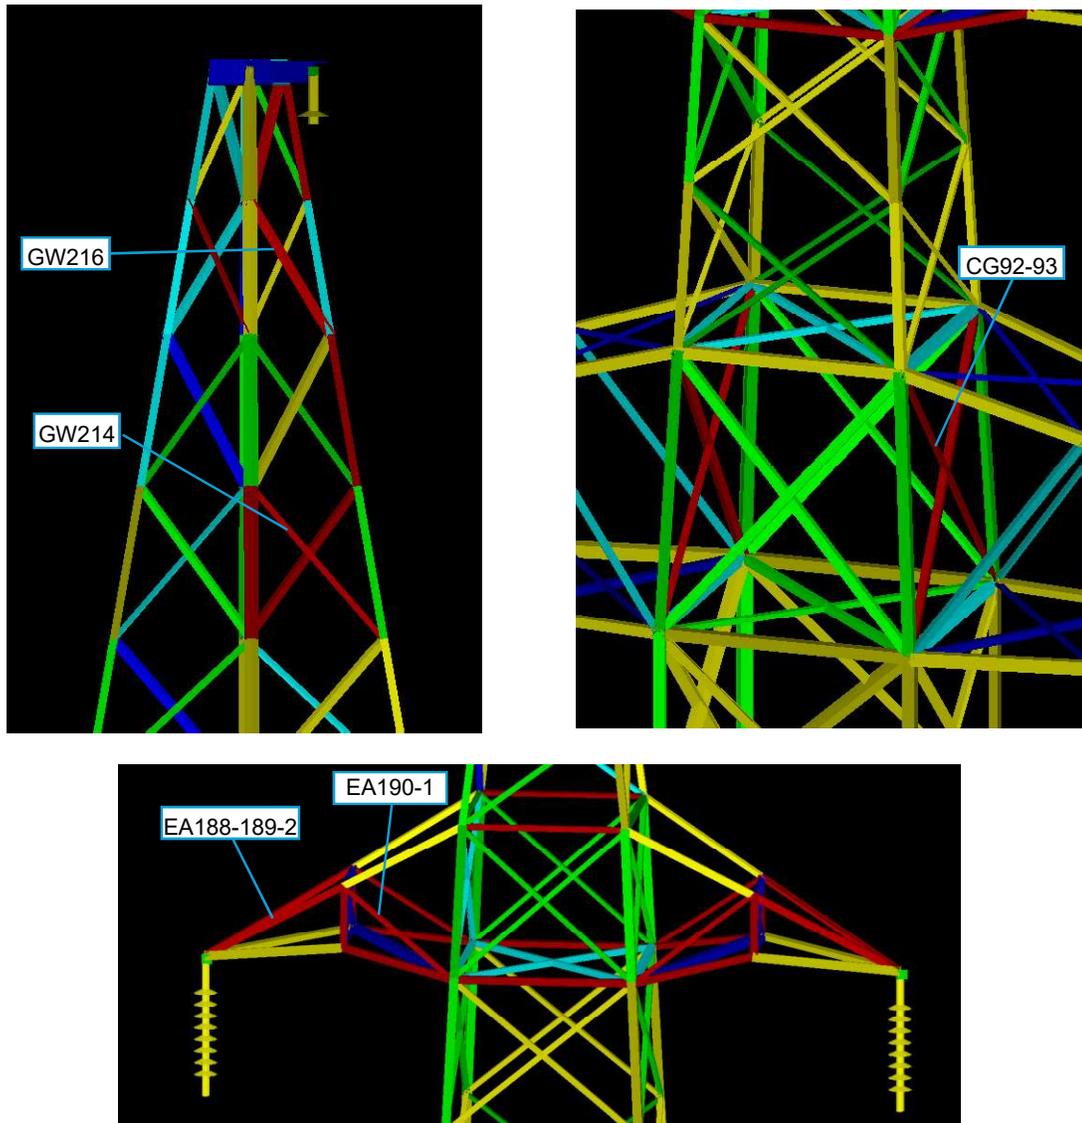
Overstressed Members Element Labels (Electrode Strung)
